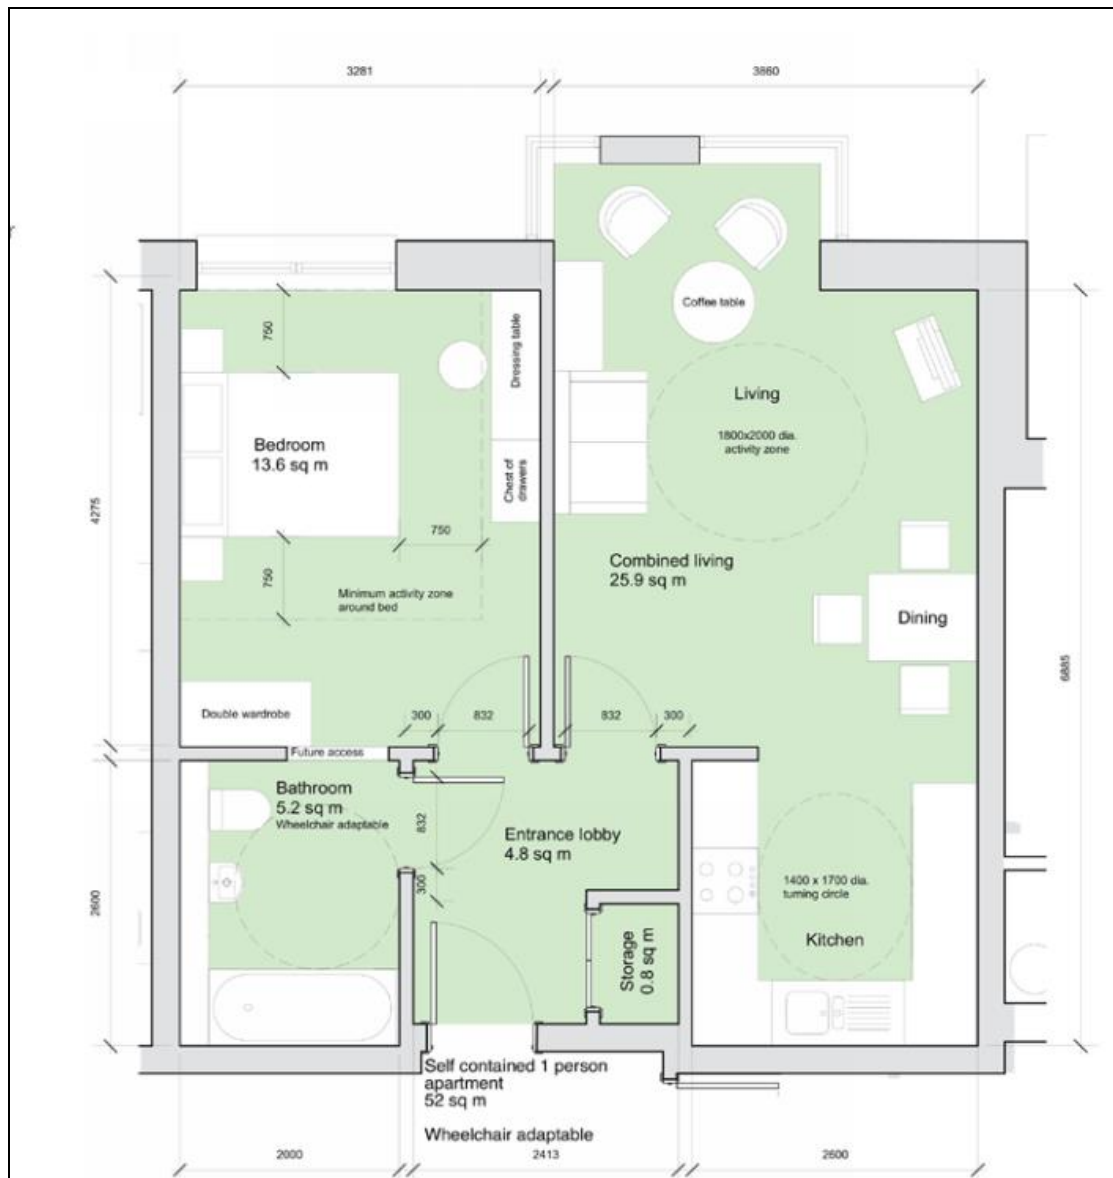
Indicative layout of self-contained wheelchair adaptable units (two will be located at first floor level and three will be located at second floor level).
